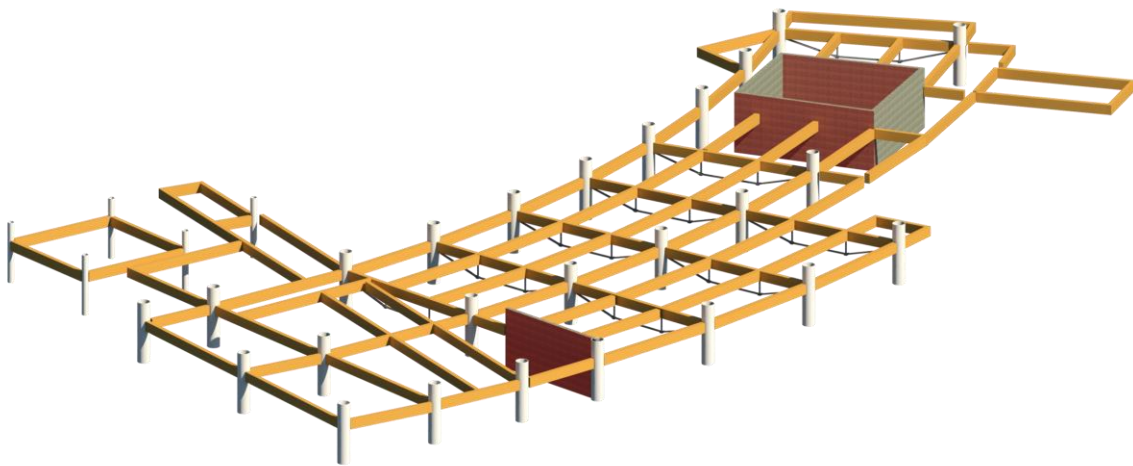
3D isometric of floor plan highlighting walls to be redesigned
